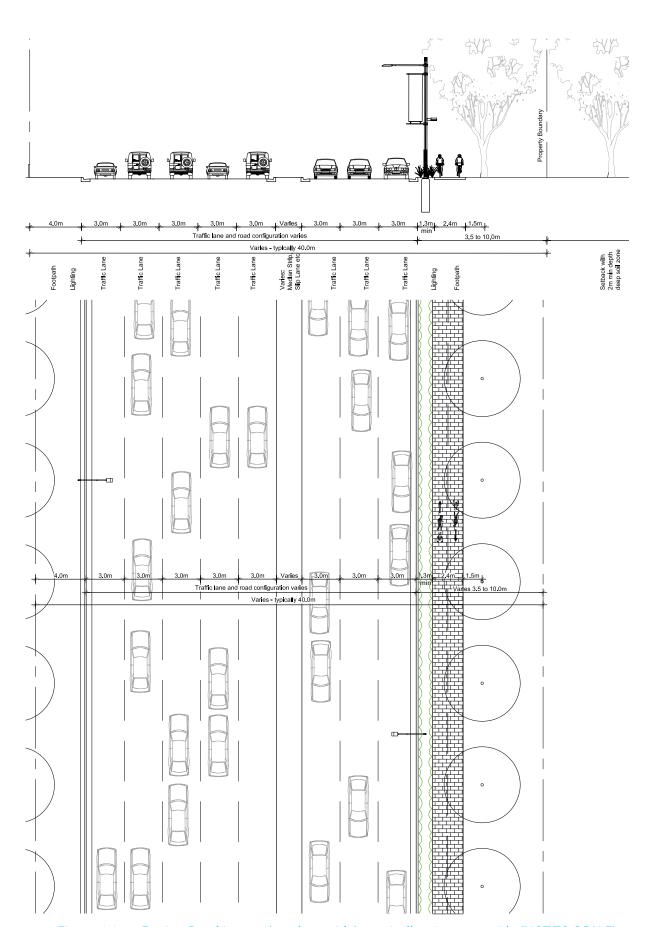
Epping Road Layout (northern side) - typically 40 metres wide (NOT TO SCALE)
